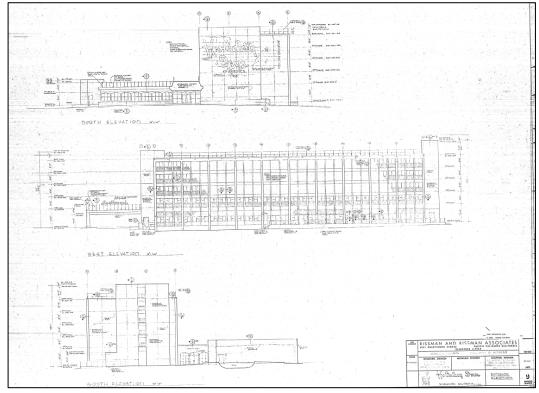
North, west, and south elevations, 1968 (Rissman & Rissman Associates)
